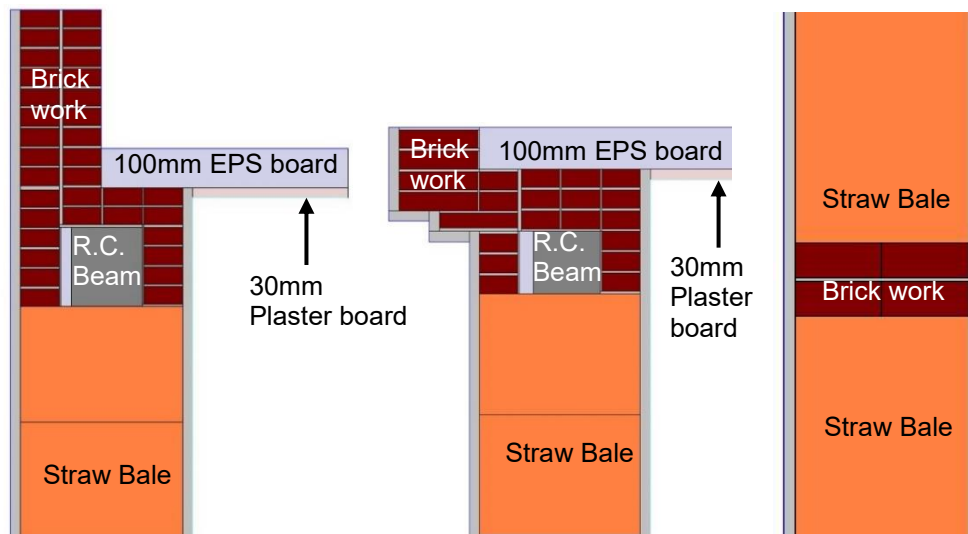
The joint construction of sidewall (left), Joint construction of south and north wall (middle) and section of sidewall in the THERM simulation.
